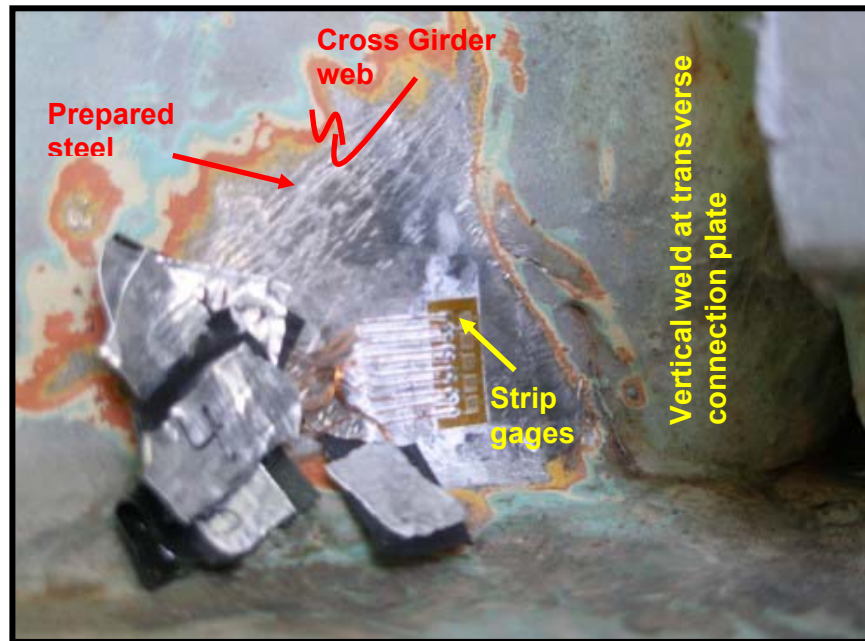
Strip gages CH_1 through CH_5 installed on the north face of the cross girder web adjacent to the zero inches web gap of the transverse connection plate detail at the east fascia
